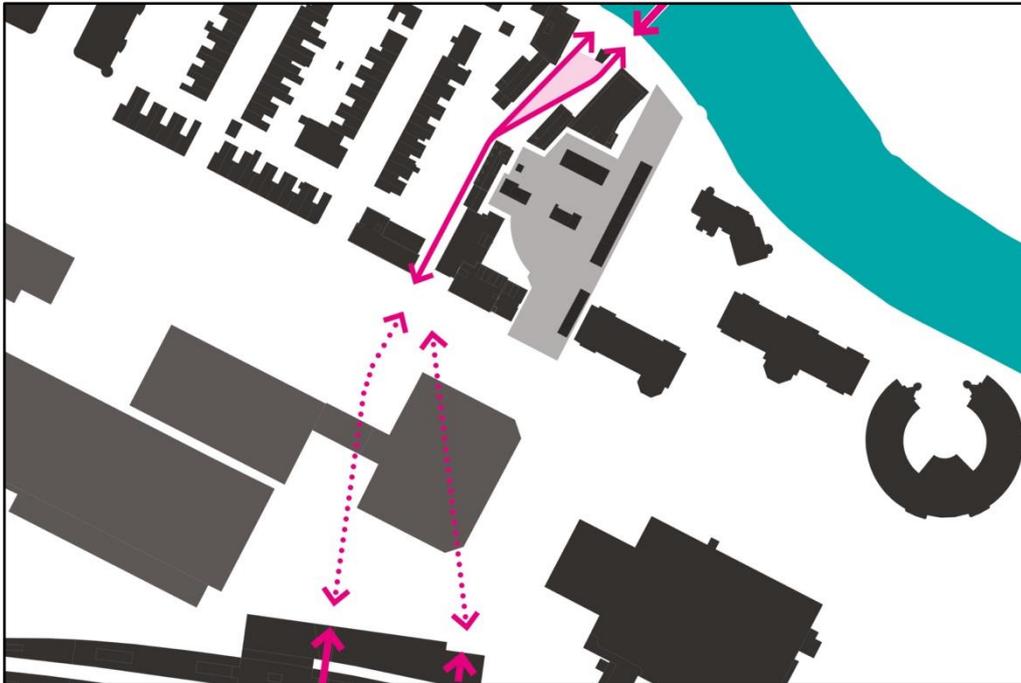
Plan to demonstrate the “direct” route between Vastern Road and the river frontage.
